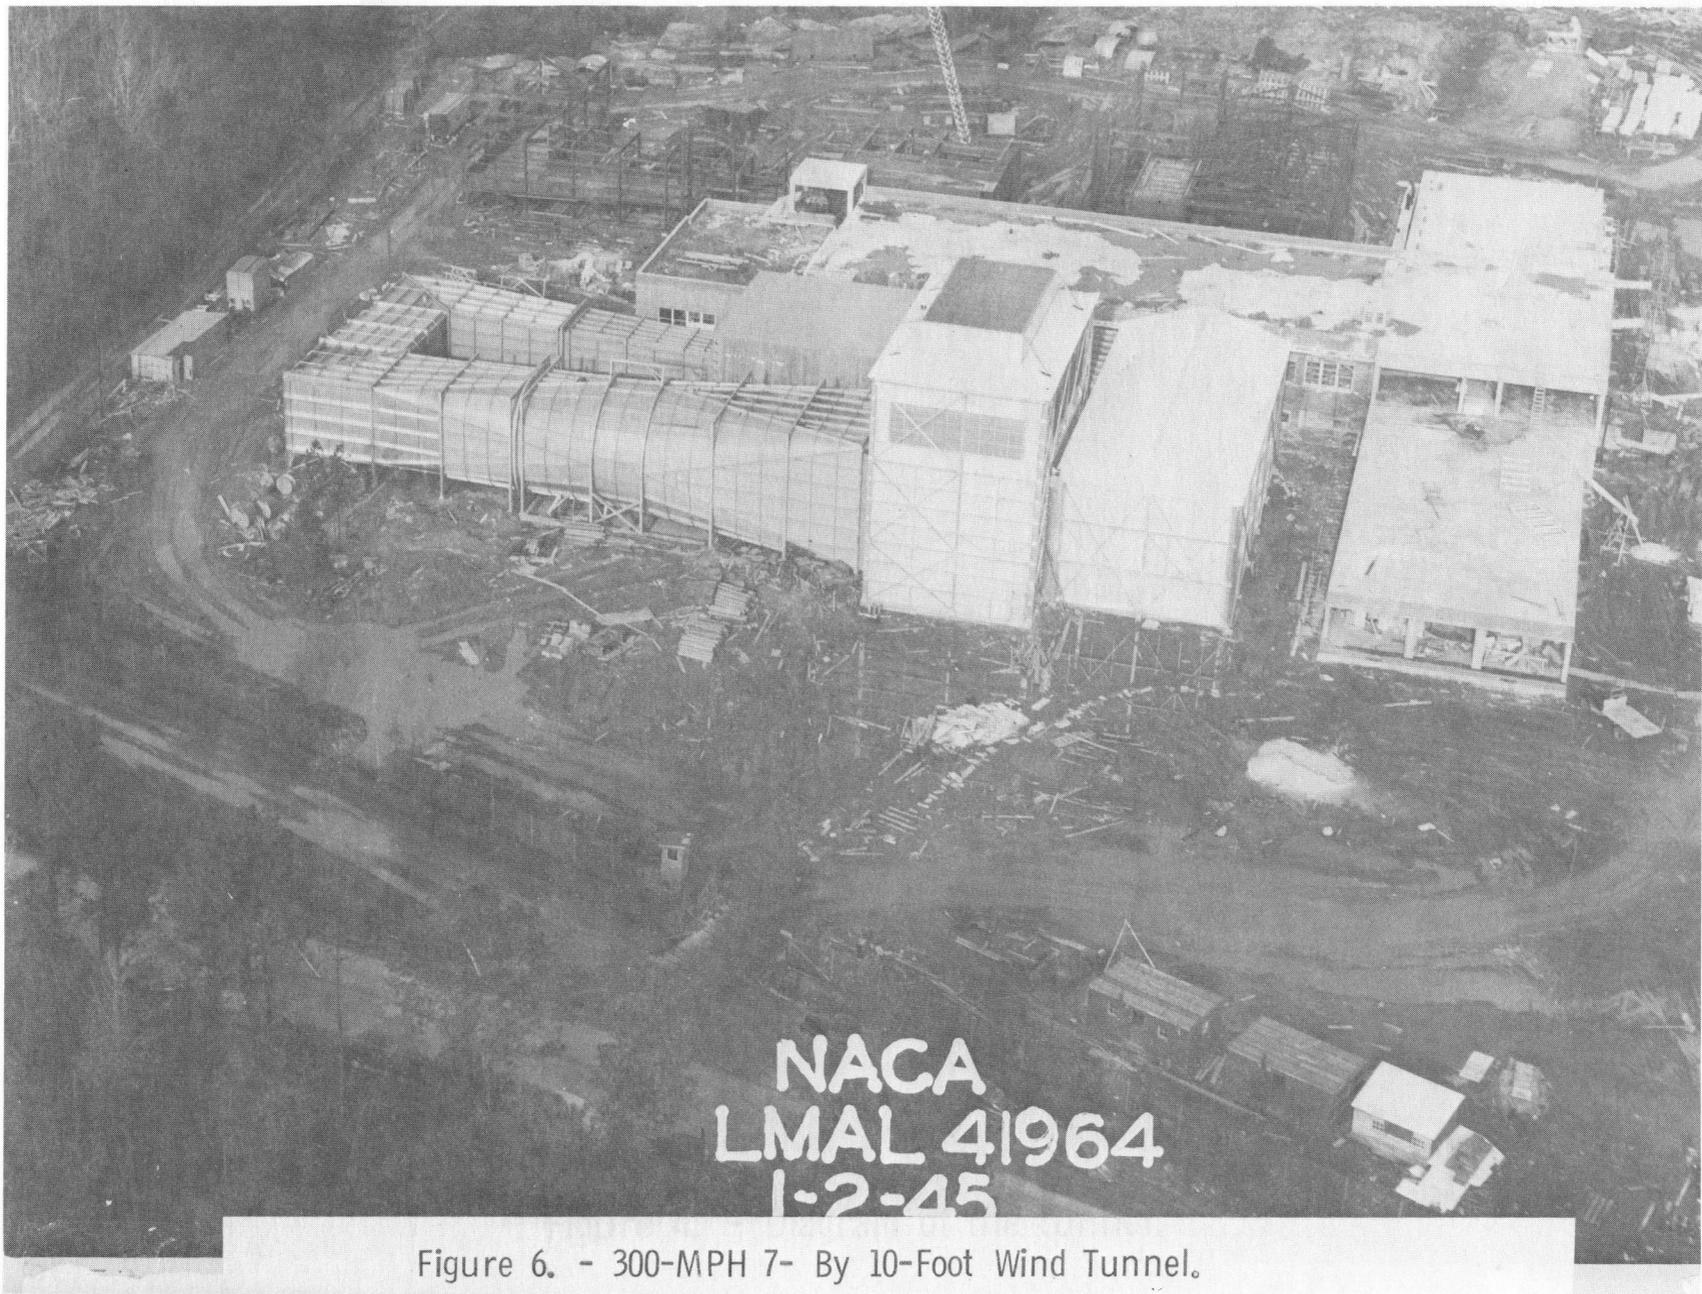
Construction photograph of 300-MPH 7- By 10-Foot Wind Tunnel.
